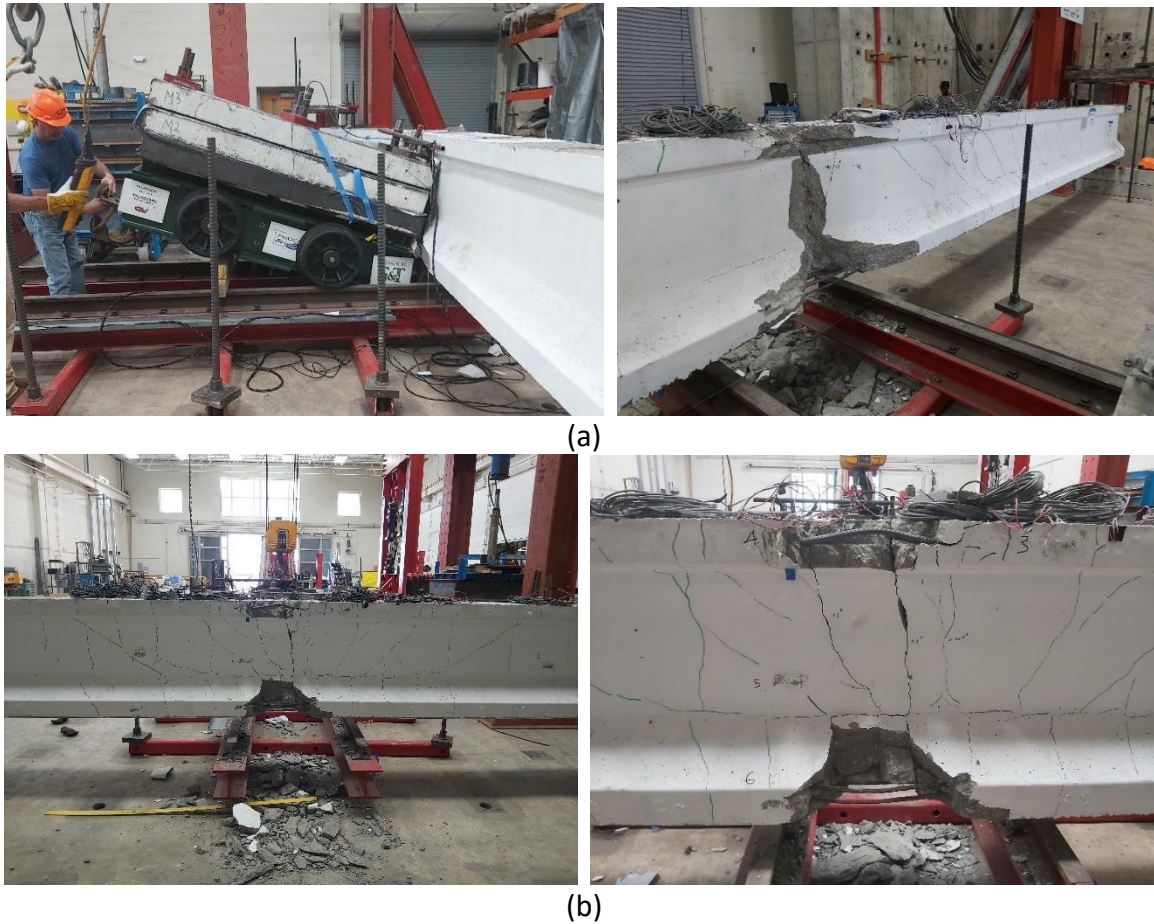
Damaged photographs of Girder G01 impact (a) Impact side, (b) Back side
